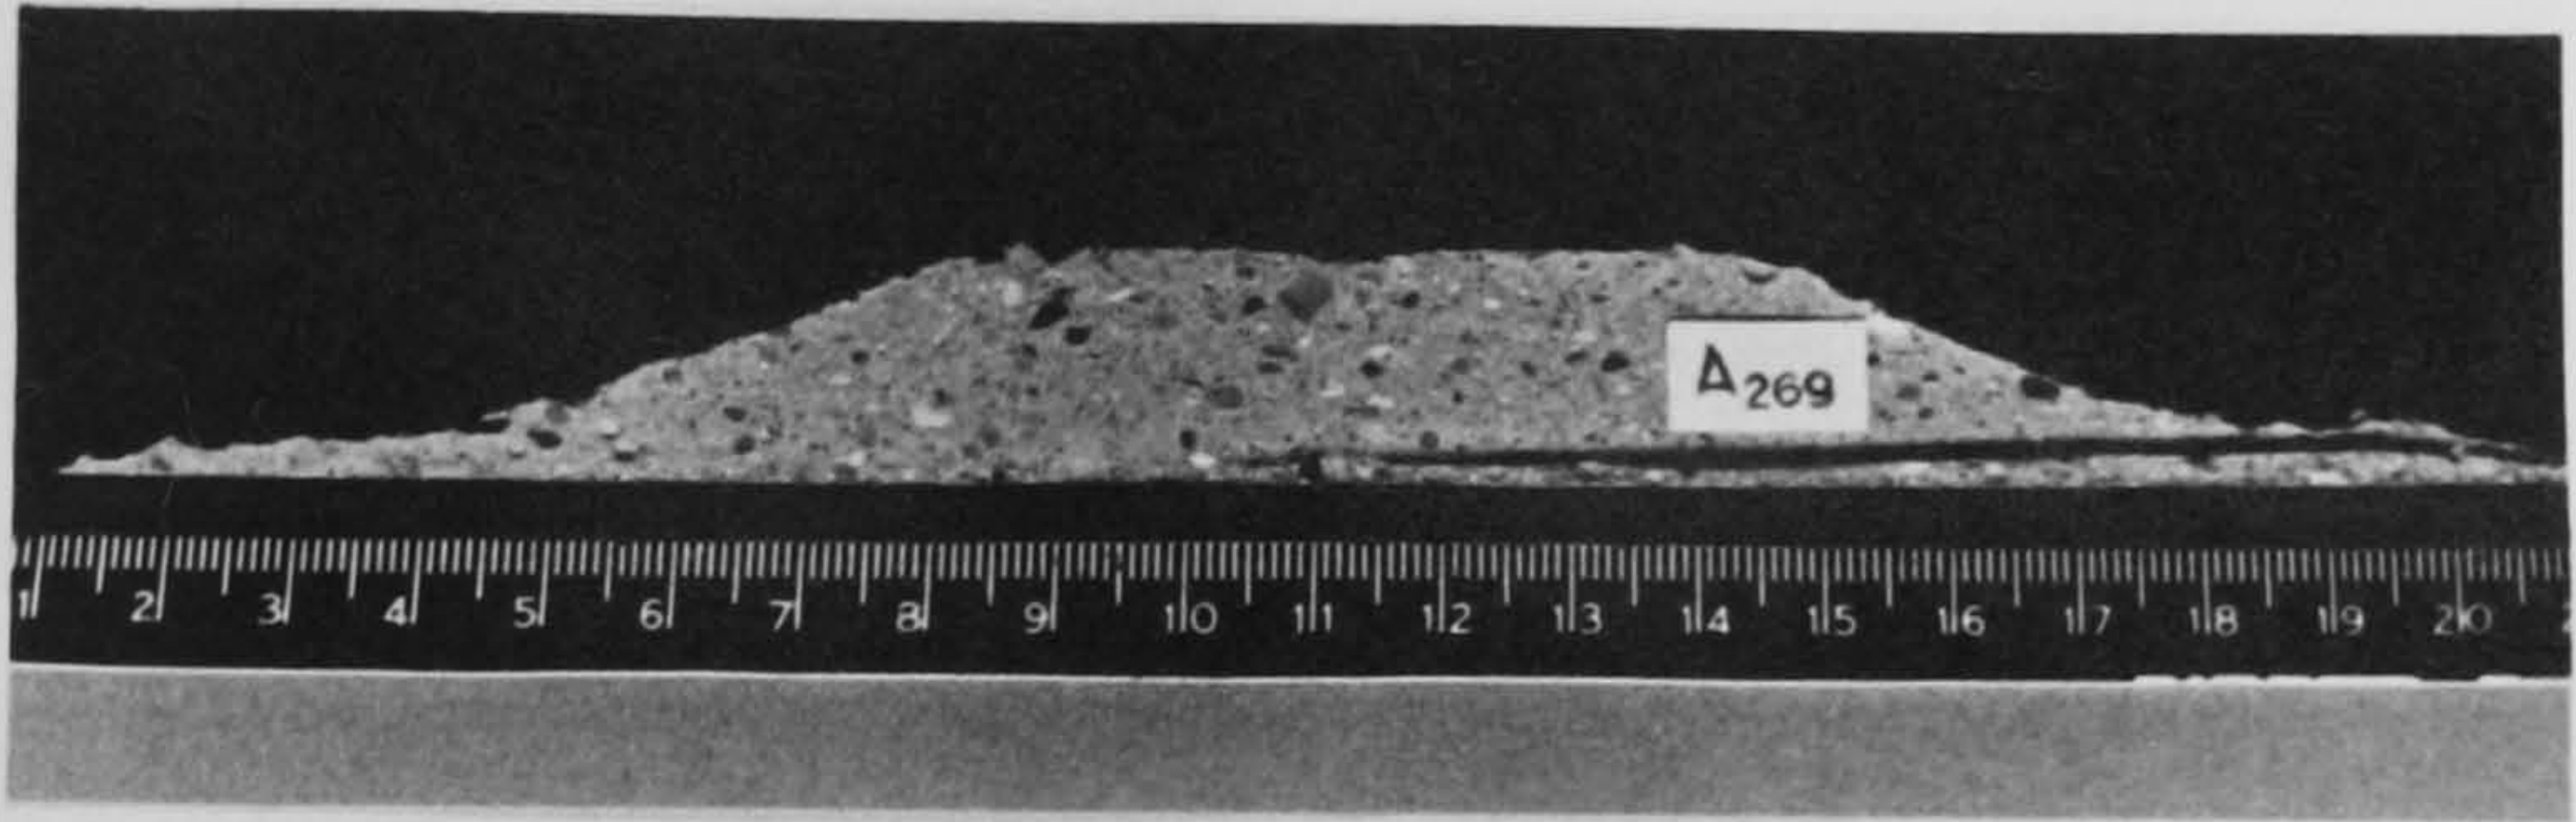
SPALLED PIECES FROM SPECIMENS
